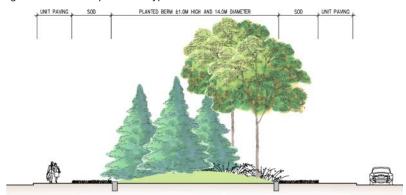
Concept Elevation of Executive Roundabout intersection
